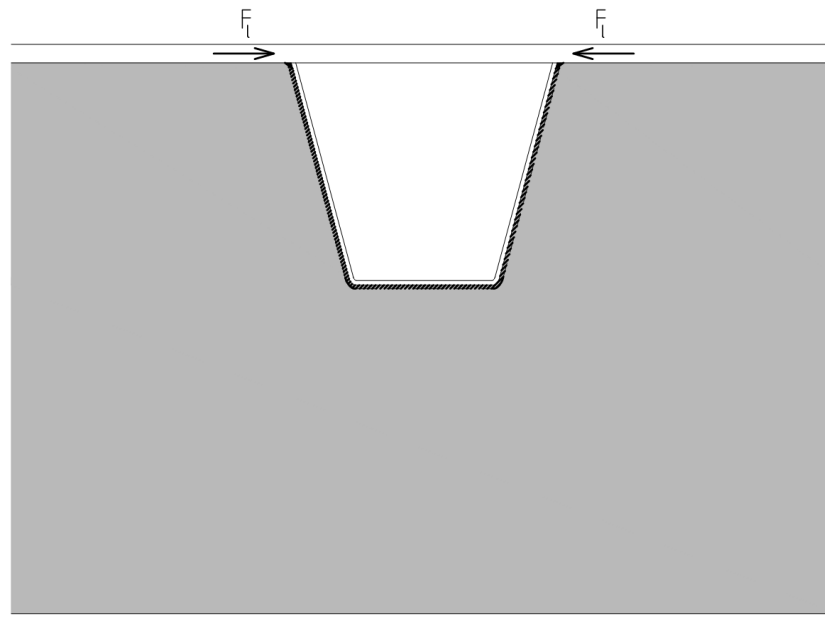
Compression of top flange of floor beam at the intersection with ribs where the flange is unsupported
